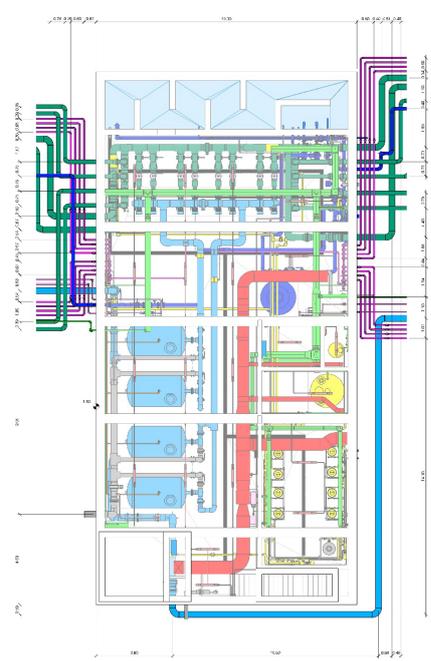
DETAILED DESIGN. ALL SYSTEMS FLOOR PLANS
